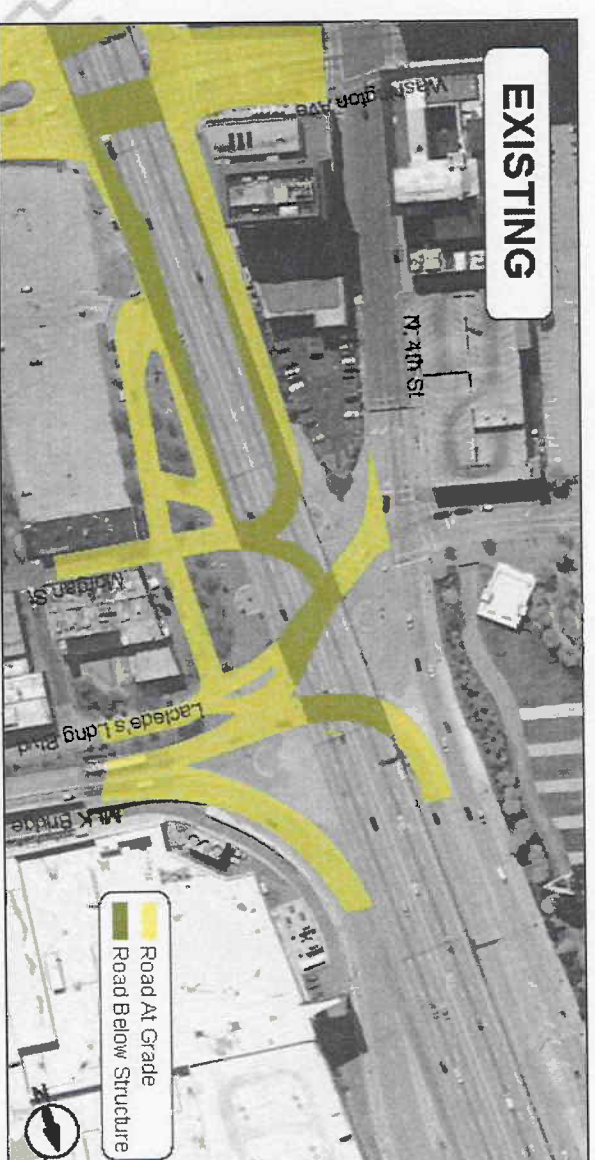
Existing Layout of North 3<sup>rd</sup> Street at Laclede's Landing
